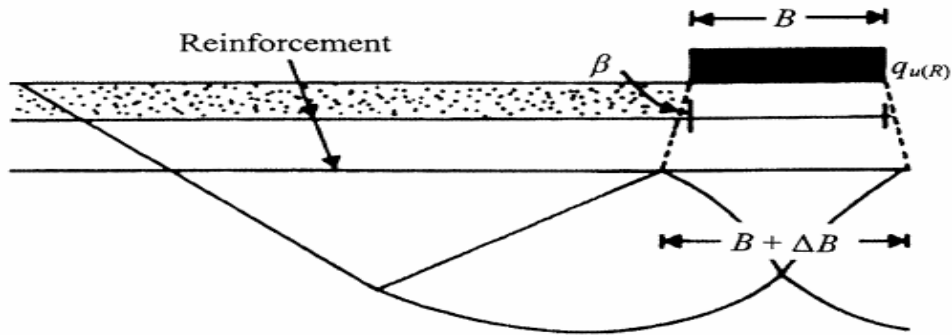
Wide-slab failure mechanism in reinforced sand supporting a strip foundation (Schlosser et al. 1983)
